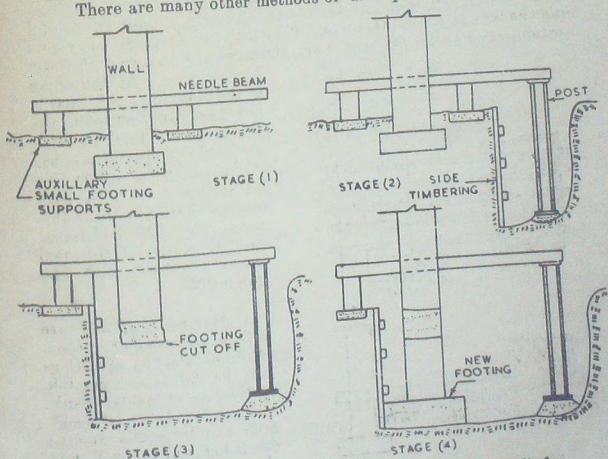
Stages of working while underpinning a wall for casting a new footing.
